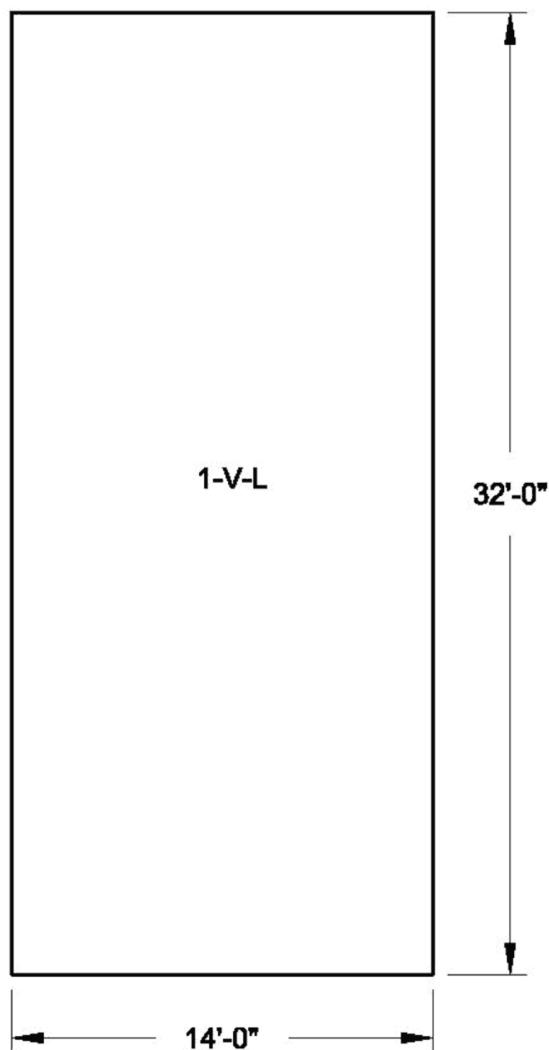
H.6-155 DGFO SV Roof 5 Looking Down
